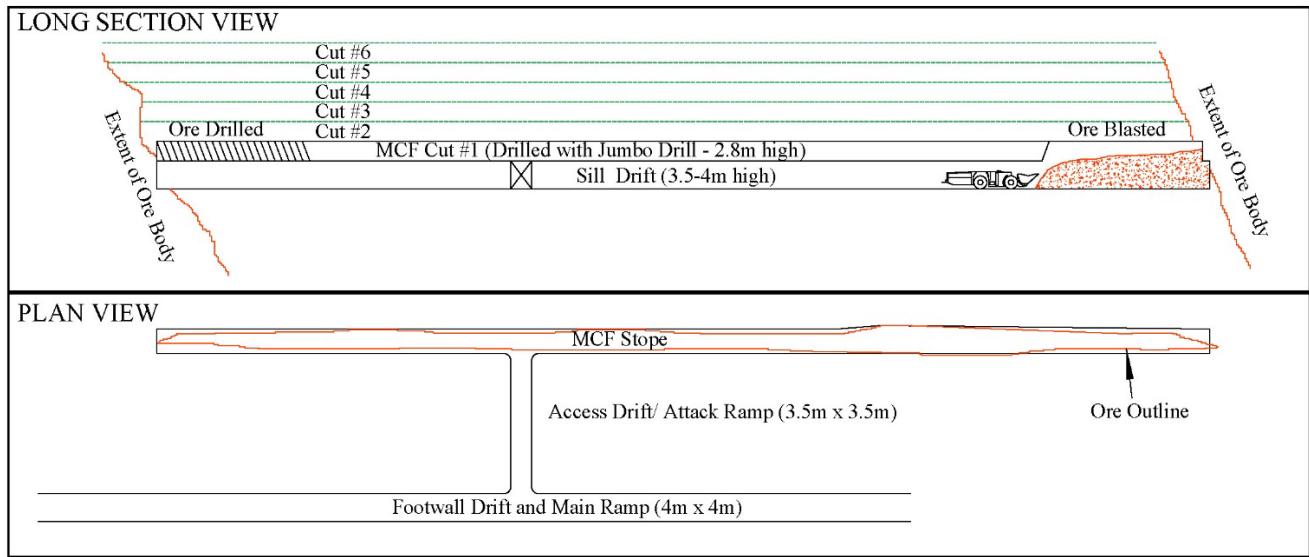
Typical Plan and Long Section through an MCF Stope (SRK 2017)
